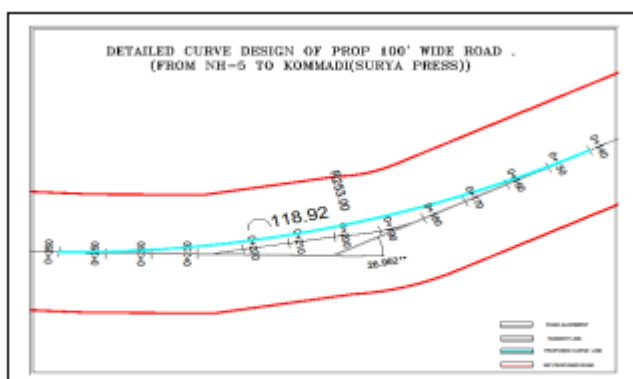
Detailed curve design at chainage 140 m to 260 m (from NH-5 to Kommadi Village)
